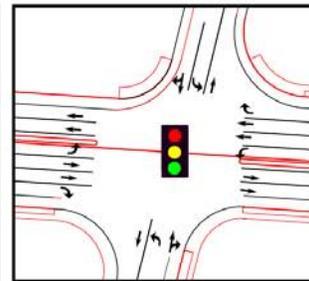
ALTERNATIVE A BETWEEN MIDWAY AVENUE AND DOWELL ROAD
